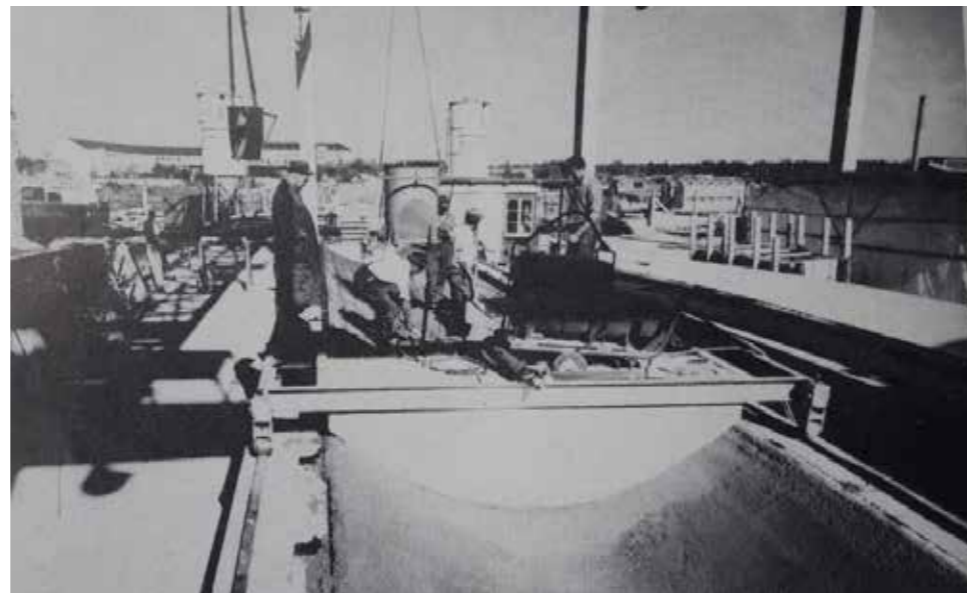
pour off concrete for a thin shell Manual of Precast Concrete Constructions Vol. 1, p. 44
